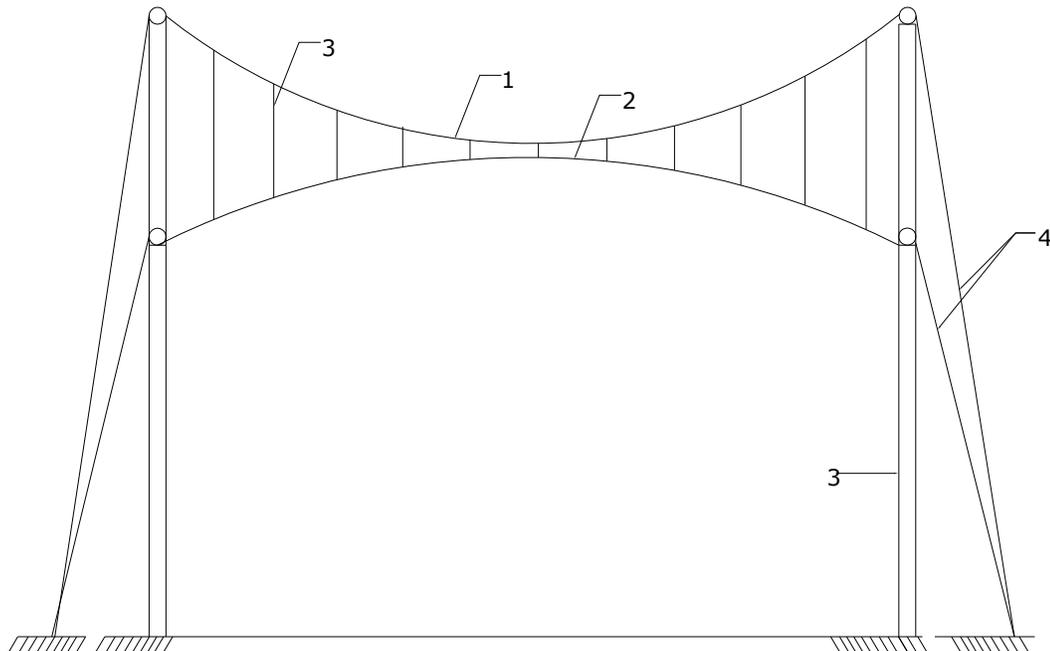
Double layer cable-concave shape for rectangular buildings
